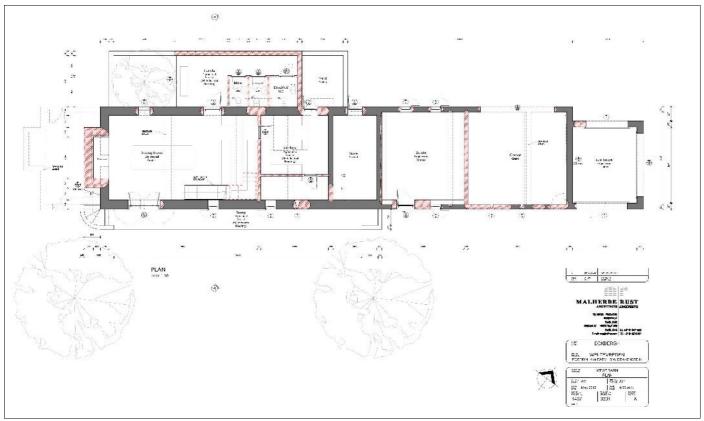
Plan of proposed redevelopment of West Barn. © Malherbe Rust Architects
